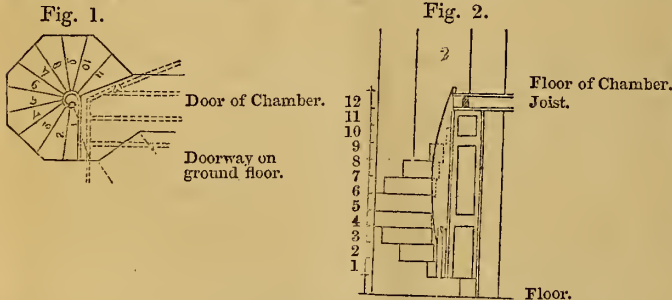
is a plan of the tower and staircase, and fig. 2. is an elevation.
